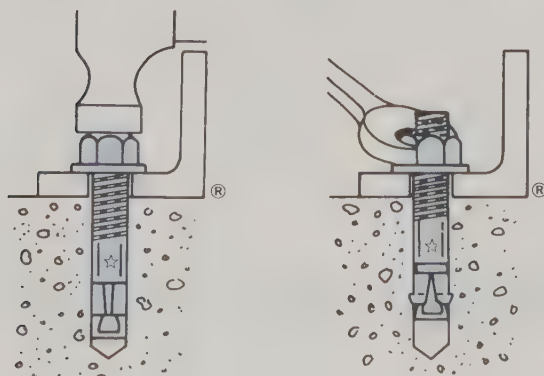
Wedge anchors are driven into a hole drilled in masonry, then expanded by tightening the bolt. (Star Expansion Company)
